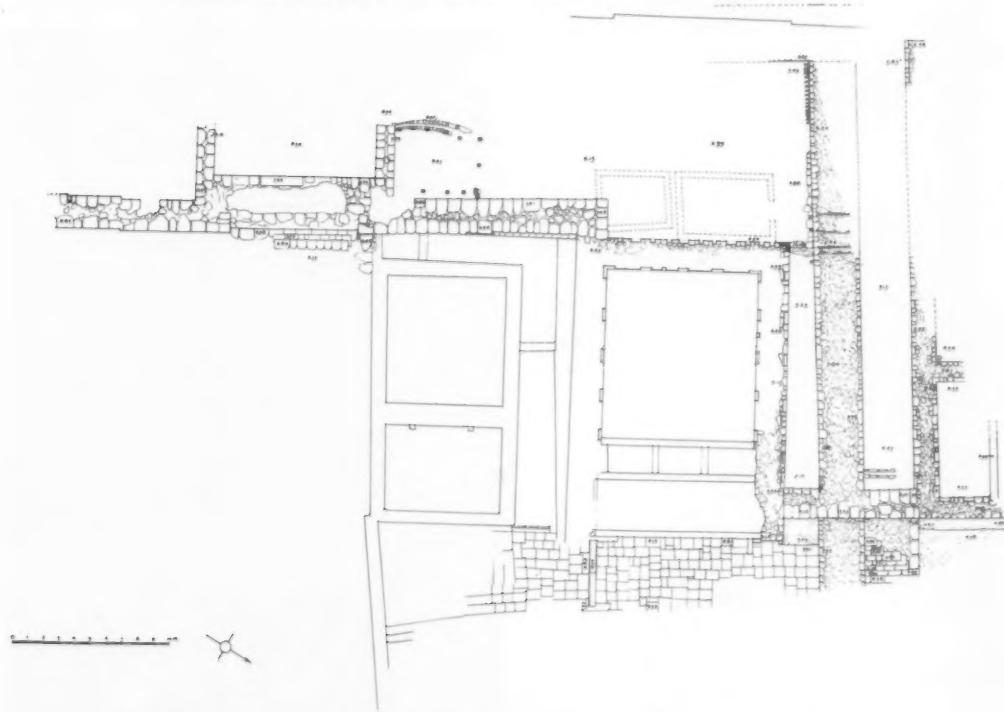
Plan of the Phrygian level: areas excavated in 1957 in detail, in 1956 in outline
